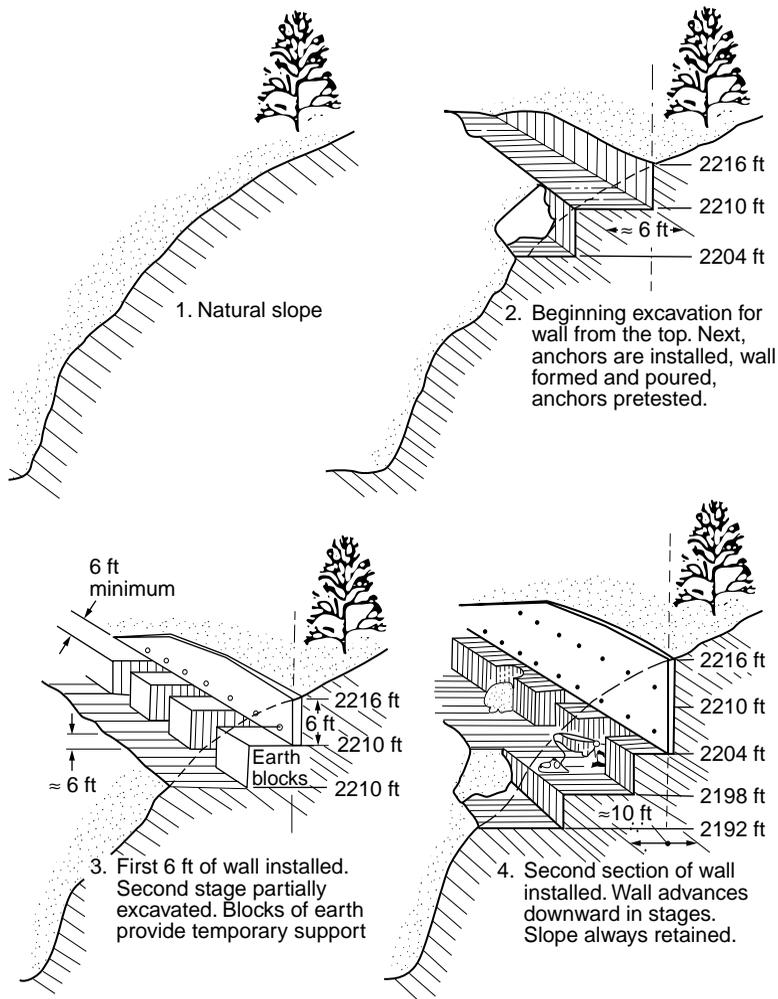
The “Brazilian method” of construction of an anchored curtain wall from the top down. (Source: Hunt, R. E., and da Costa Nunes, A. J. 1978. Retaining walls: Taking it from the top. *Civ. Eng., ASCE*, May, 73–75.)
